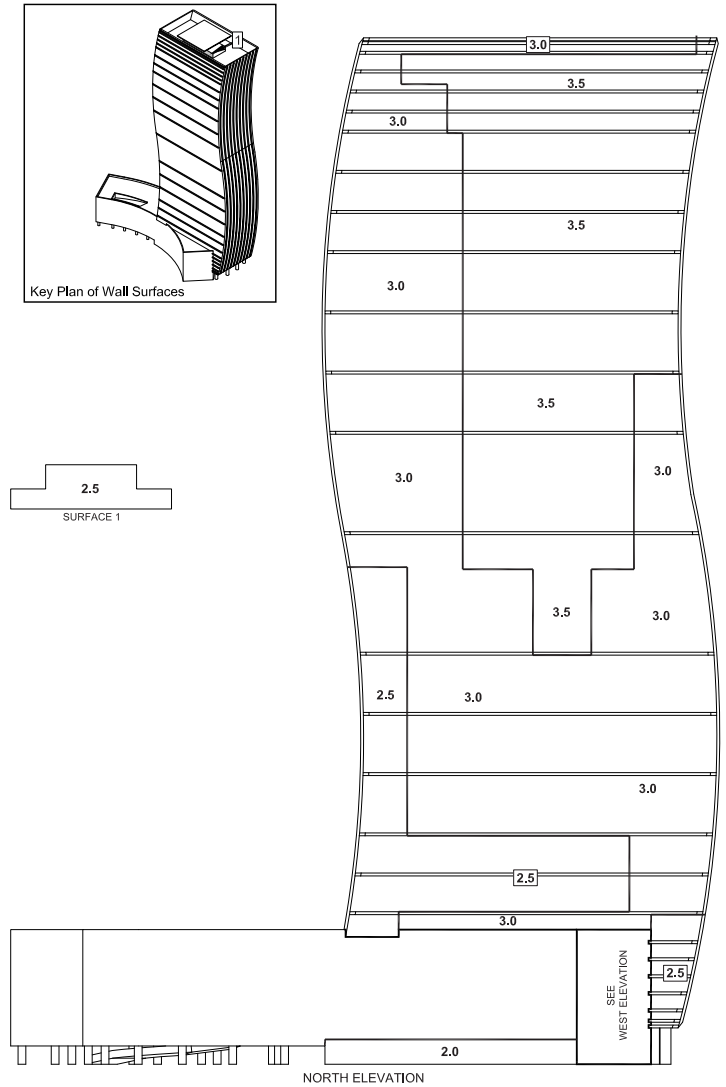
Wind tunnel test study, determining wind loads for cladding design. Peak net positive pressures. © RWDI
